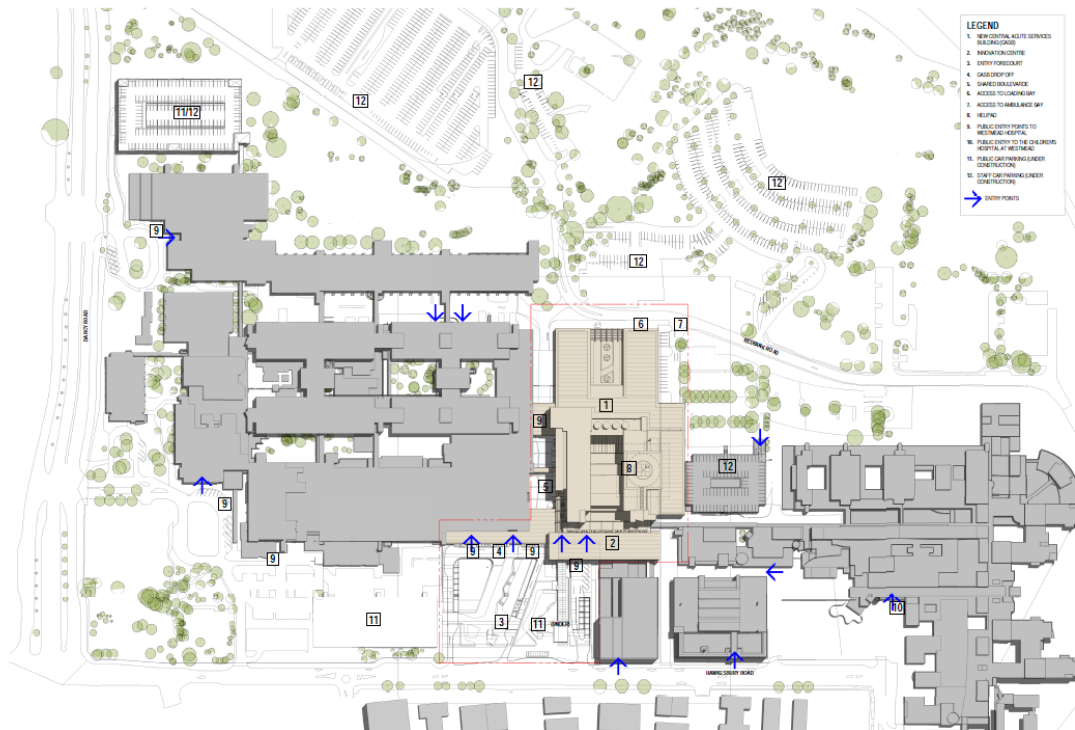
Westmead Redevelopment, Stage 1 Proposed Site Plan
